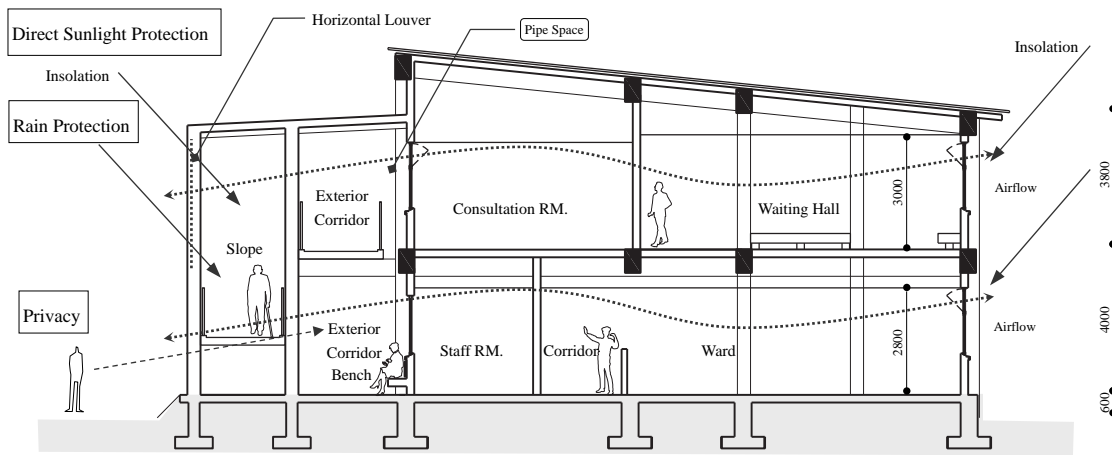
Kanyama Lv1H Cross-section of Outpatient Department and Ward
